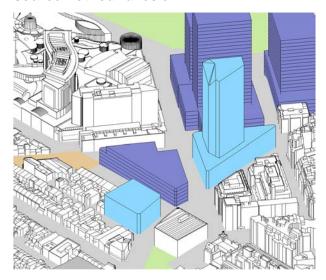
location plan of 13A-29 Union Street & 69-71 Edward Street
